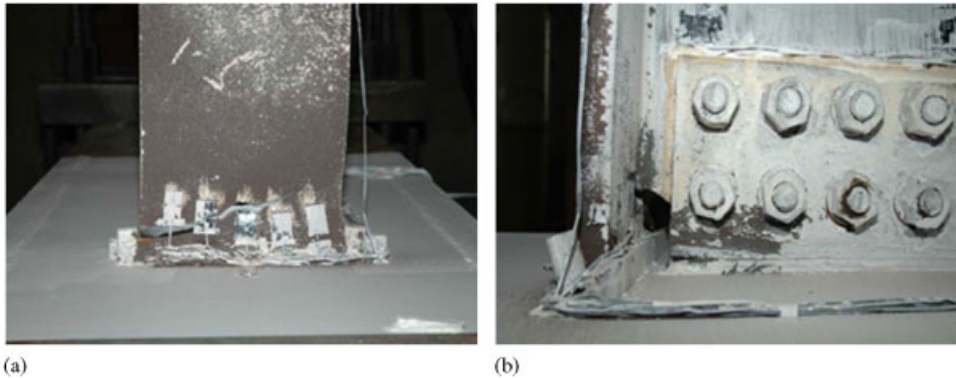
Specimen UR failure modes (-4% drift): (a) beam top flange fracture and (b) shear plate fracture.
